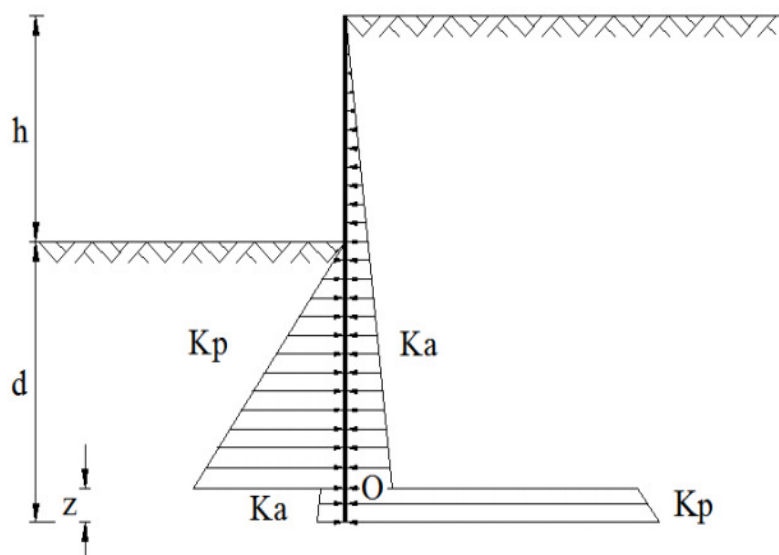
Net pressure for a cantilever wall (Alejo 2013)
